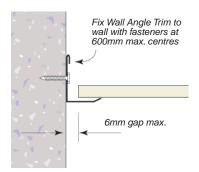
PERIMETER DETAIL FOR NON FIRE RATED CEILINGS
